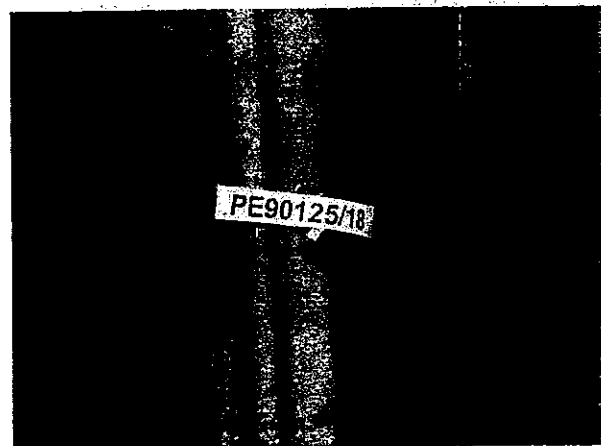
Flexible Joint at Generator Room, Room 124, 1/F of Block 1 was confirmed as Non-ACM (Sample No. PE90125/18).
